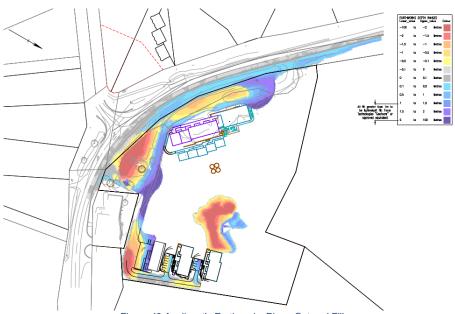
Applicant's Earthworks Plan - Cut and Fill
